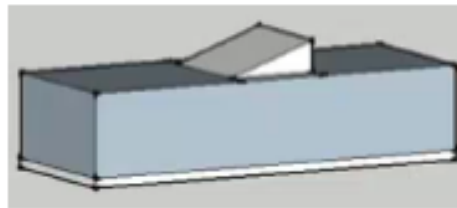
Sloped roof cathedral ceiling with step wall, typical with flat roofs.
